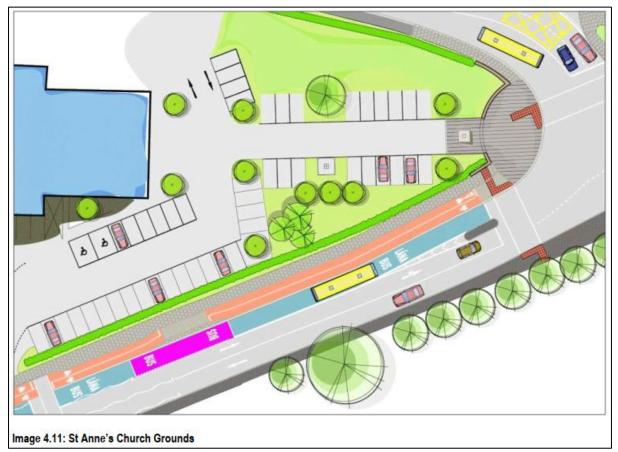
Extract from Landscape Drawings at St Anne's Church on Dublin Road (Sheet 43)
